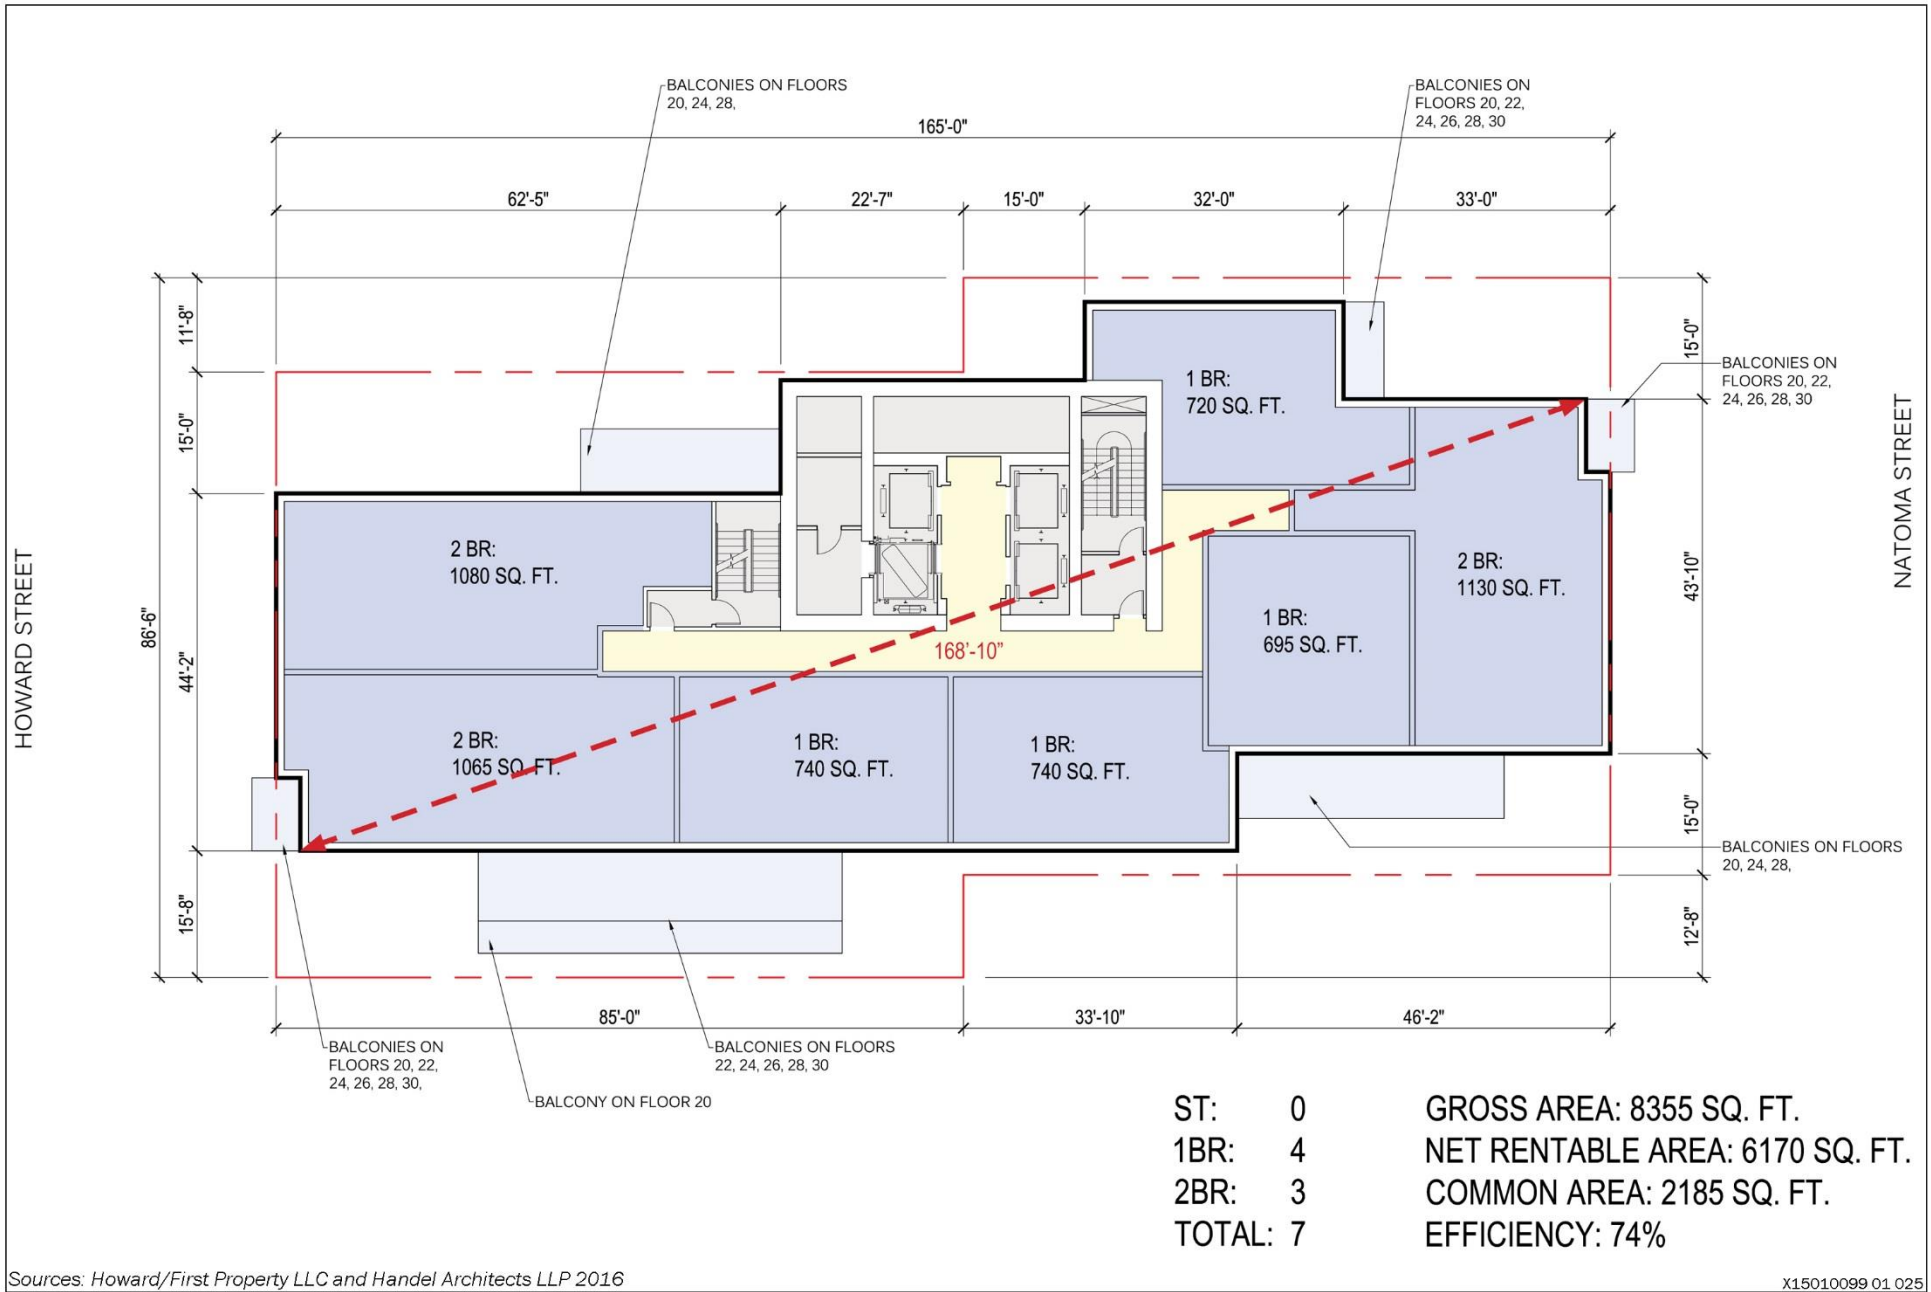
Conceptual Residential Floor Plan (Floors 20 through 30)
